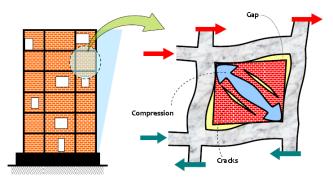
Deformation of RC frame Building with URM In-fill Walls
